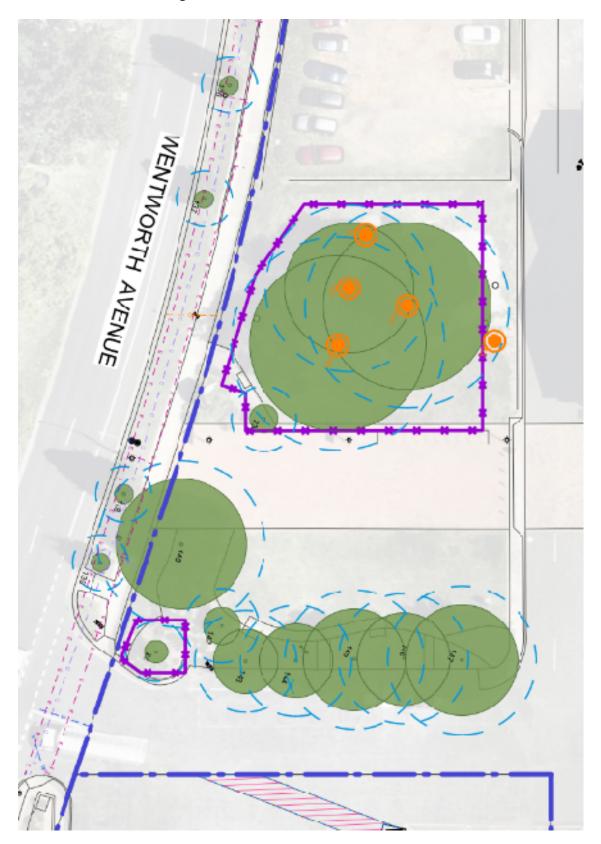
Snapshot of trees 120 – 123 on the Tree Management Plan site plan outlining the Tree Protection Fencing in PURPLE.
